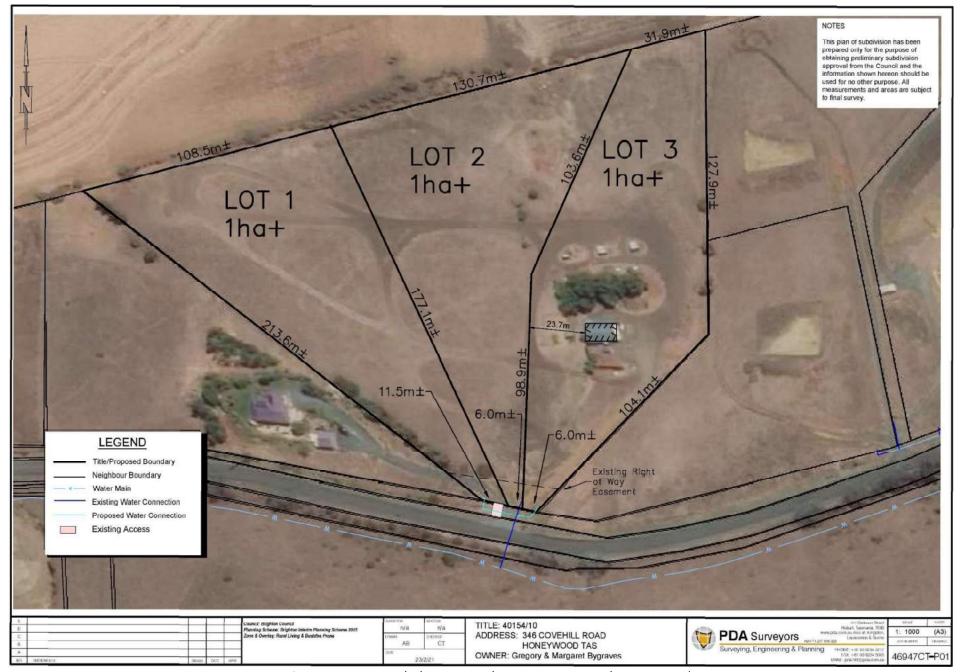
Proposal Plan page 1 (PDA Surveyors, February 2021)
